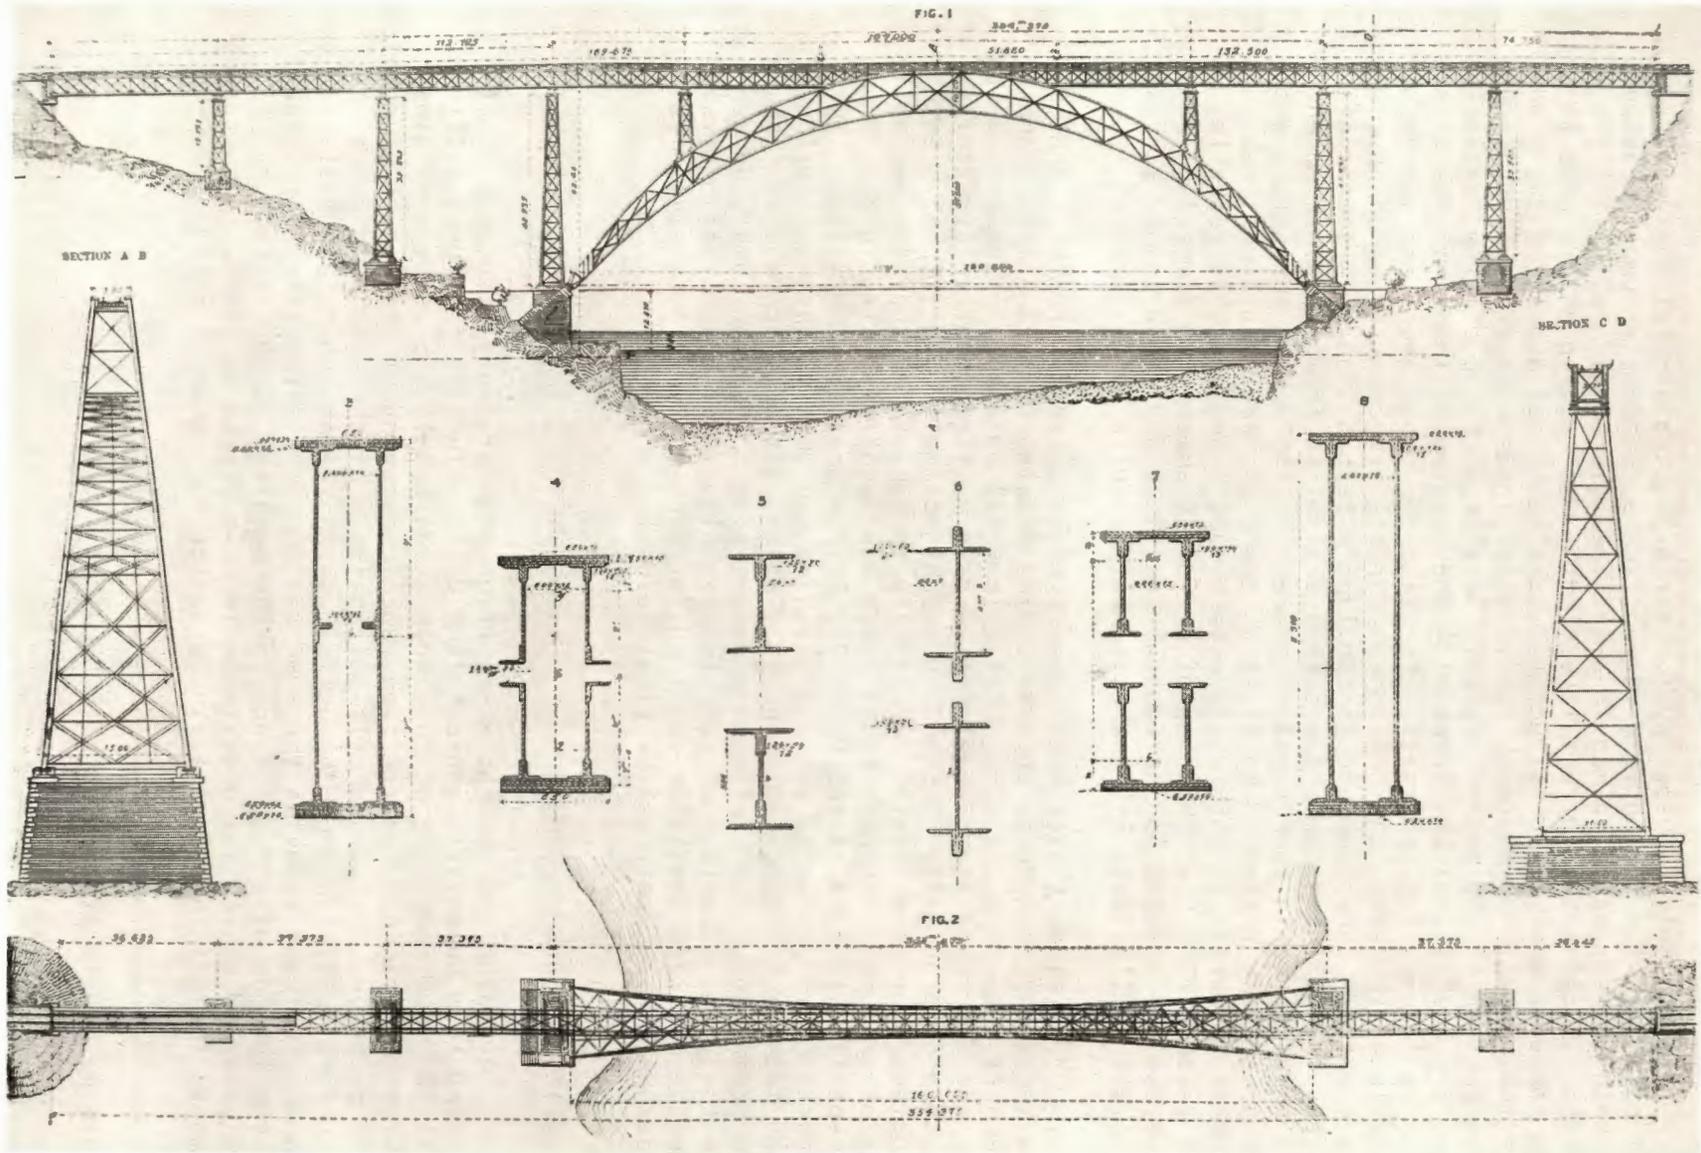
ELEVATION, DETAILS AND PLAN OF MARIA PIA BRIDGE (from The Engineer, Vol. 45, 1878)
